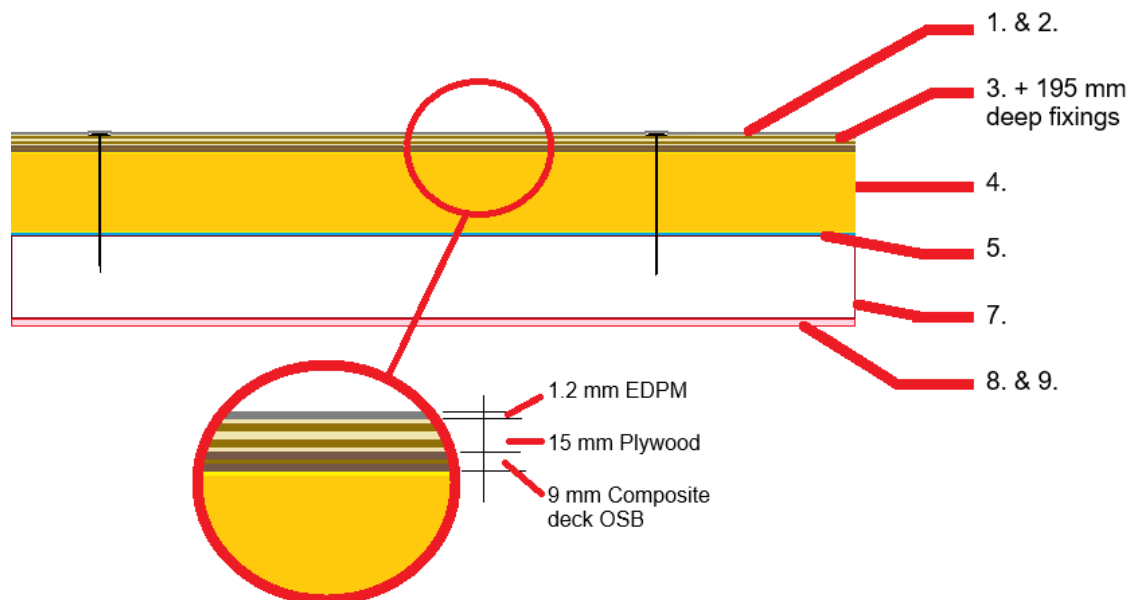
Construction type 2 – *composite deck*, comprising 120 mm thick foil faced polyisocyanurate insulation bonded to a 9 mm OSB deck (not plywood as shown) with an additional layer of 15 mm thick plywood (firrings not shown for ease of drawing)
